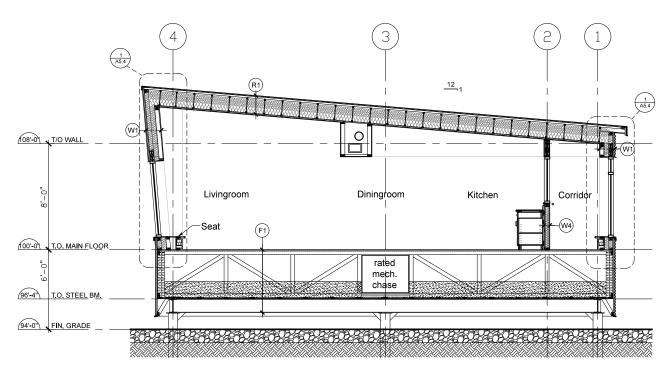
building section showing above-ground deep floor trusses and rated mechanical chase Source: GUY Architects, Yellowknife, NWT
